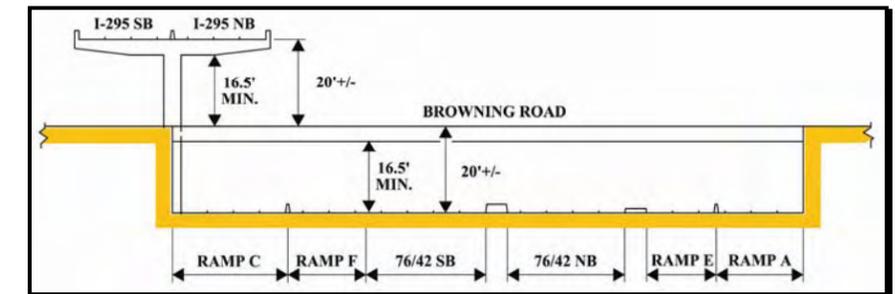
Section A-A at Browning Road (Alternative A1)
